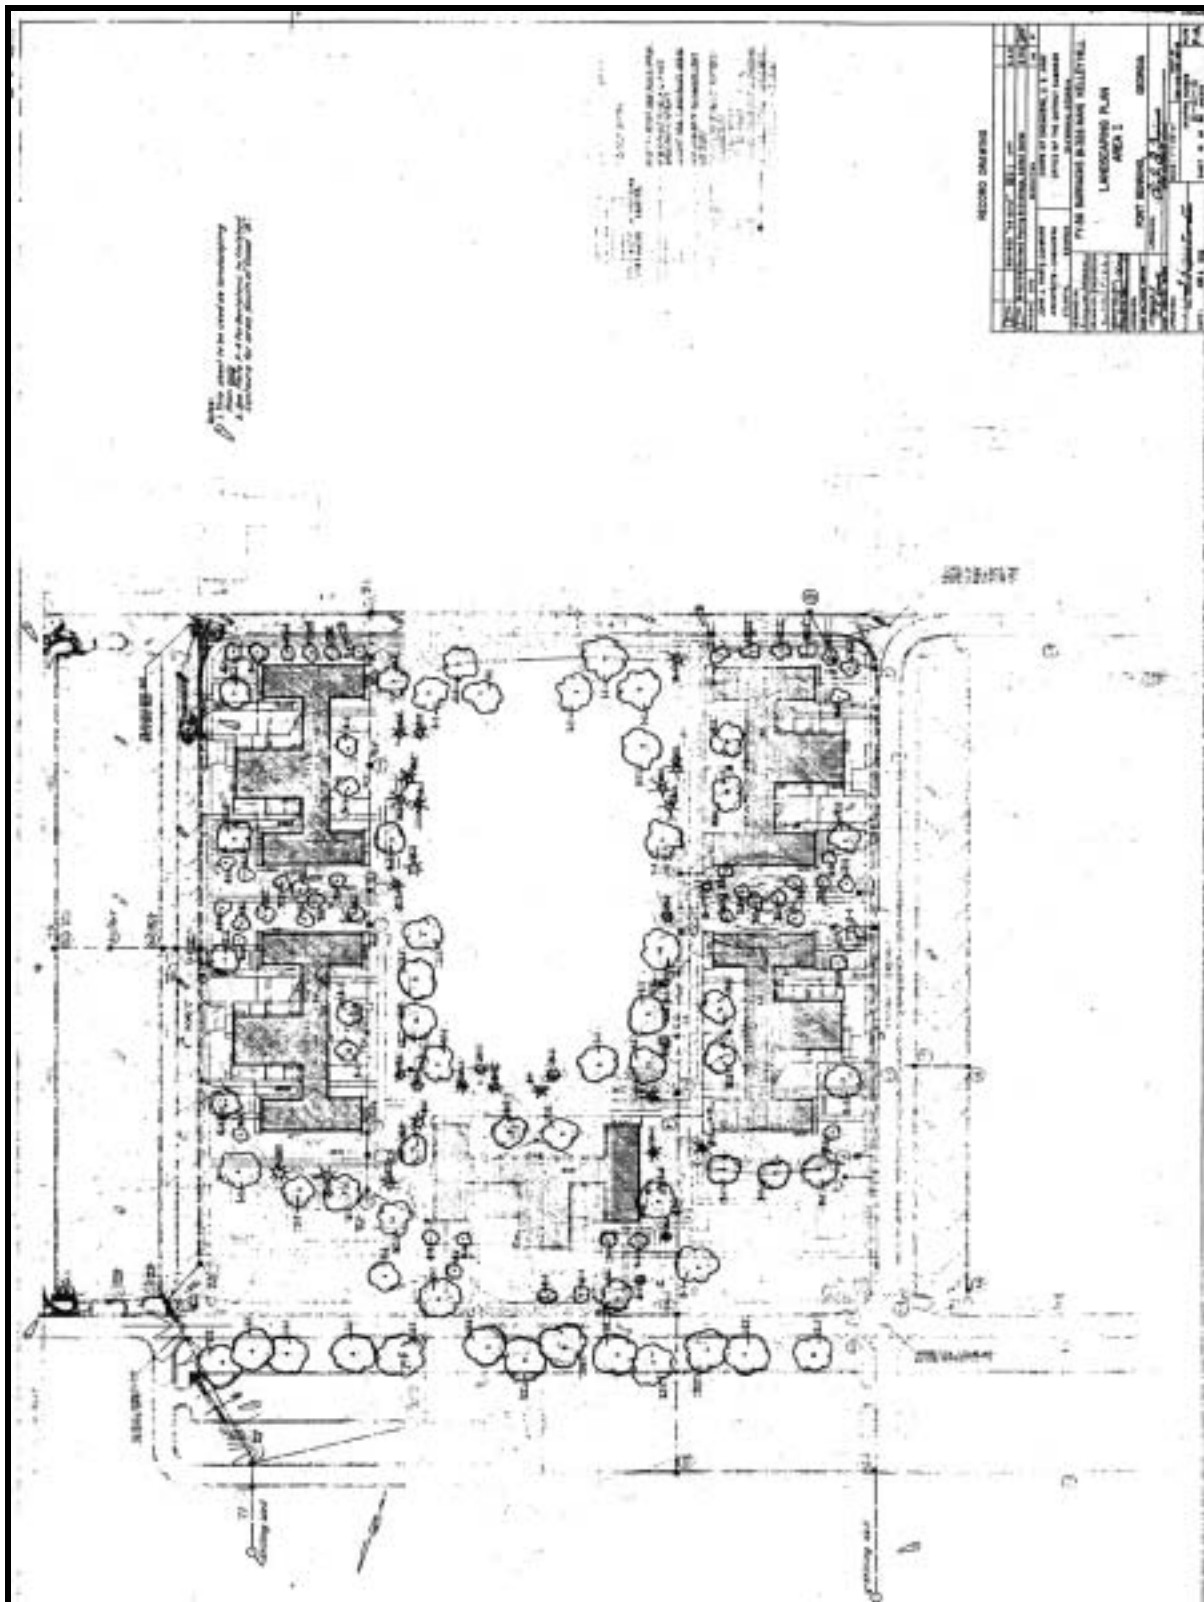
H-style, two-company barracks complex, landscape plan, Ft. Benning (1956, revised 1958) (Engineering, Ft. Benning).
